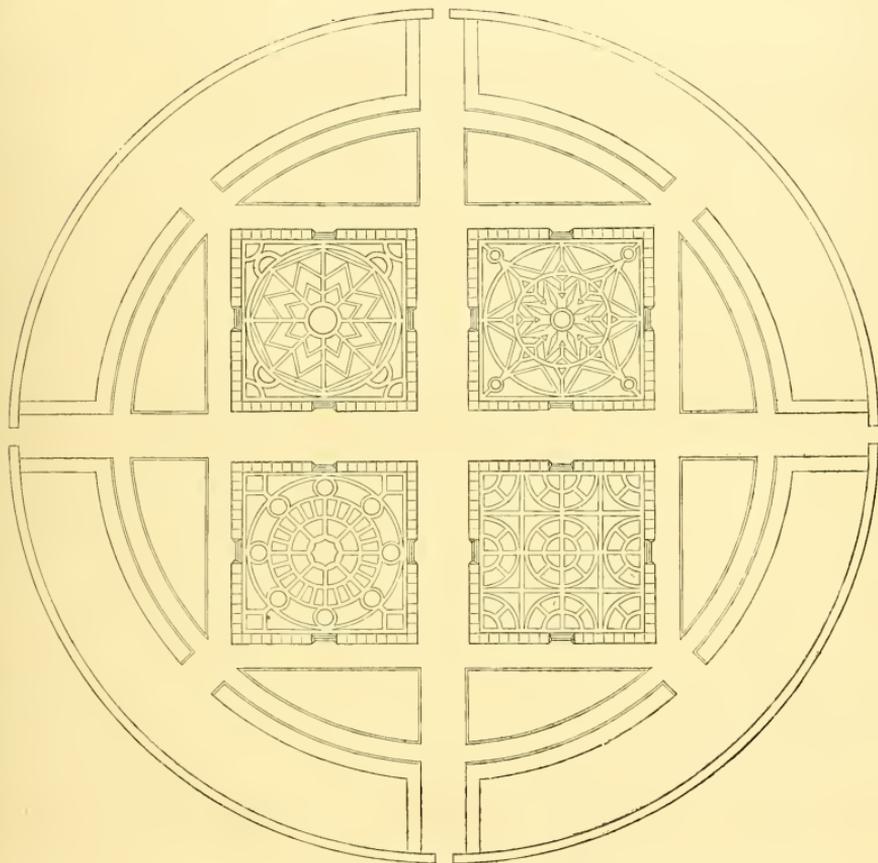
ORIGINAL PLAN OF THE BOTANIC GARDEN AT PADUA.
